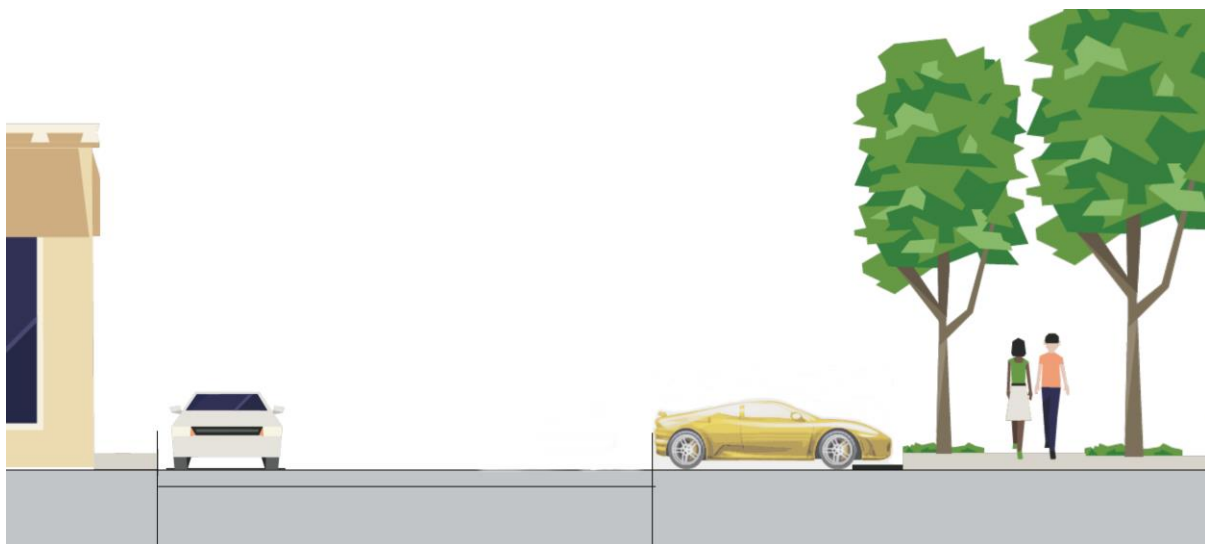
Example of sidewalk between planting strip and parking lot driveway (along Parkways).
